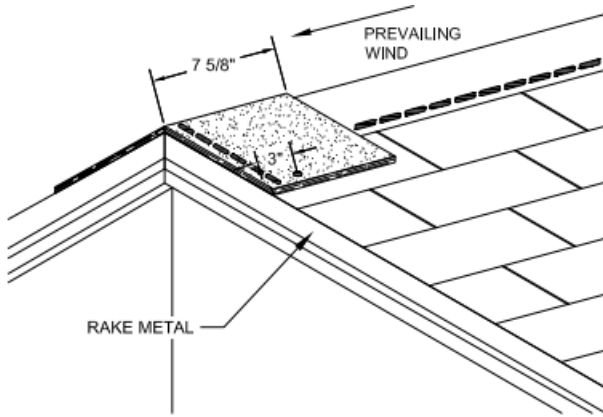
Placement and Fastening of the RidgeFlex™ Starter Shingle
